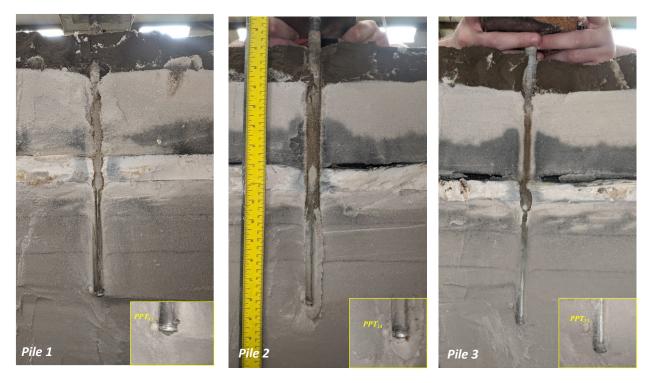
Cross-section view of Pile 1, Pile 2, and Pile 3 during the excavation process.
